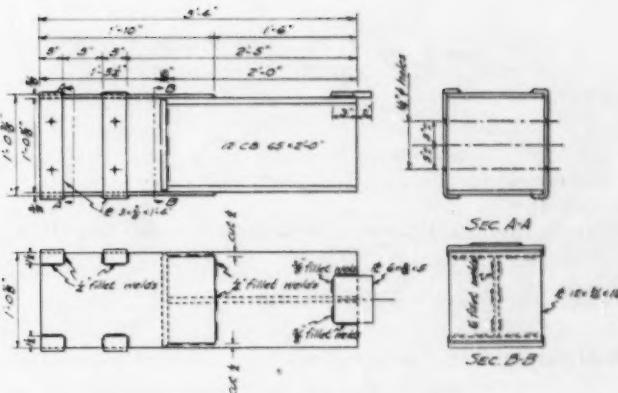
Detail Drawing, 12-in. Strut Shoe.
